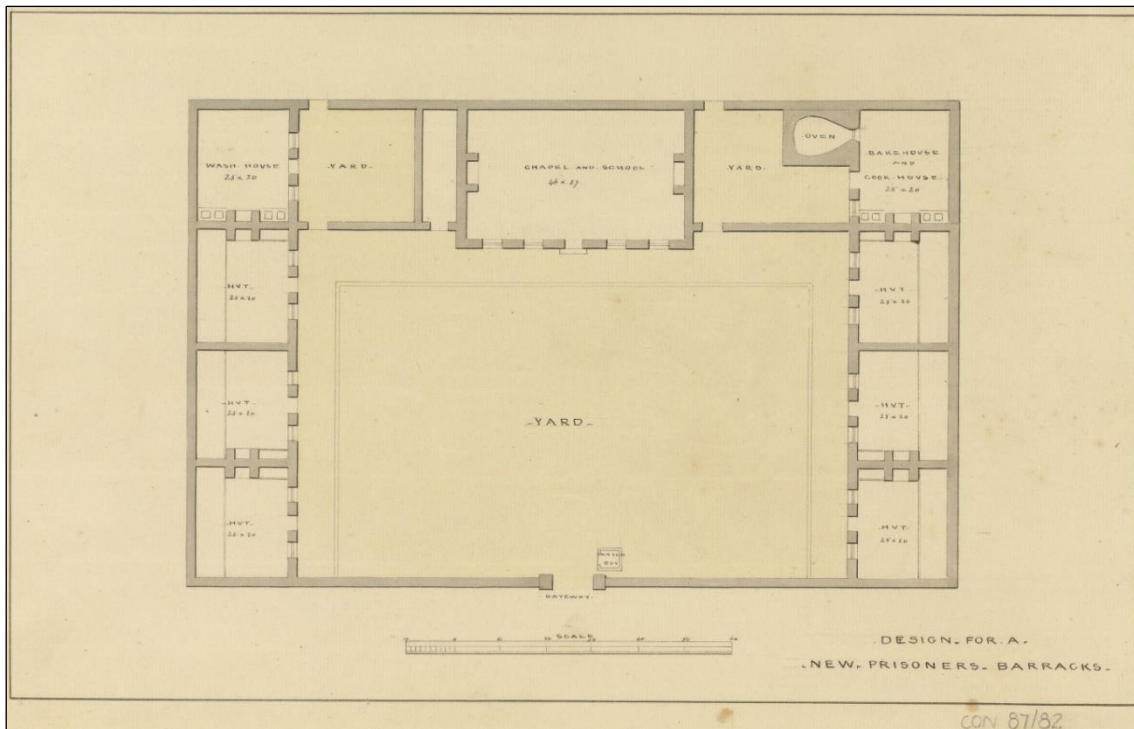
Proposed plan of second barracks, Tasman Peninsula. The finished layout of the actual barracks closely resembled this proposal
